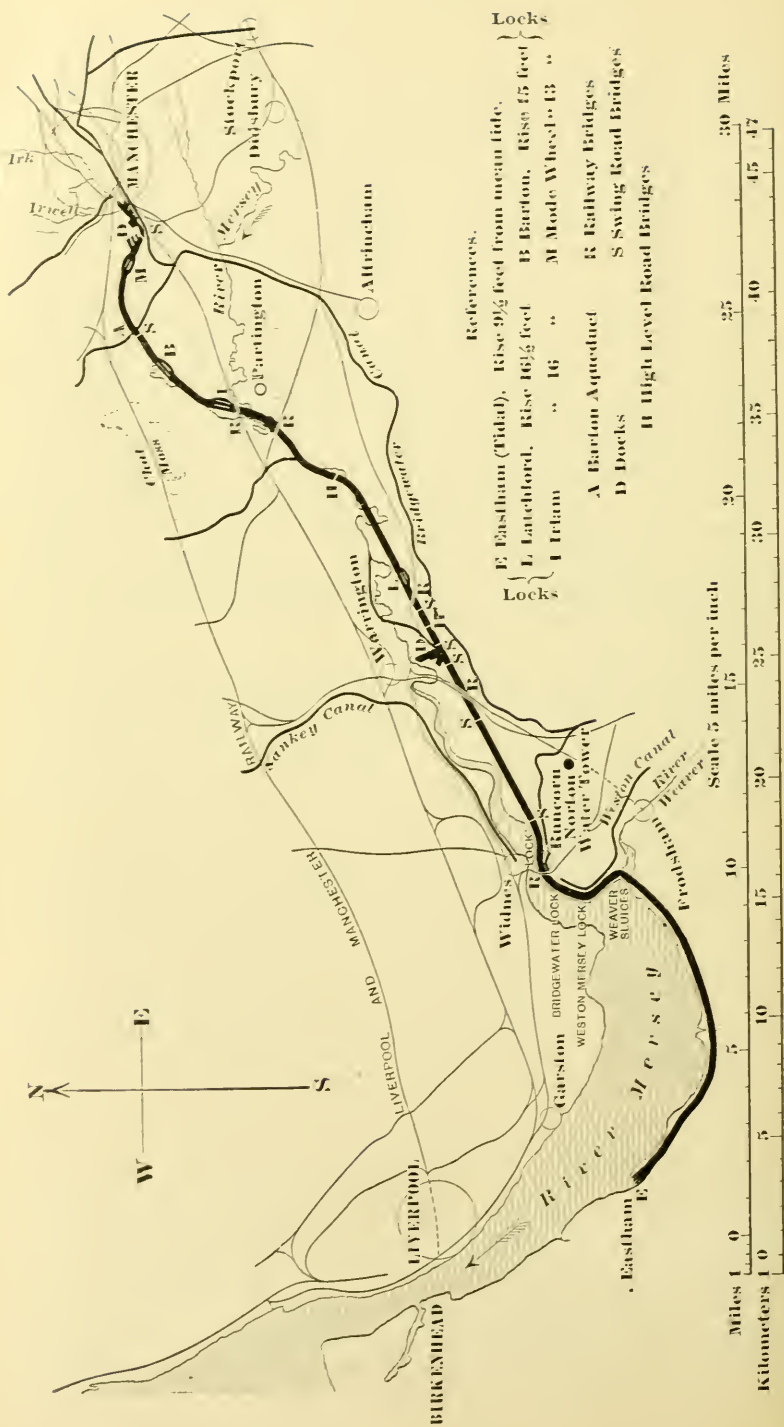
MANCHESTER SHIP CANAL. PLAN.
